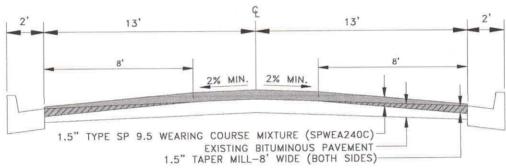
Residential Overlay with Curb – Bituminous Overlay Typical Section
